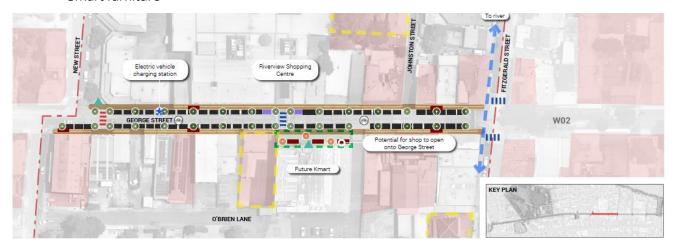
Proposed upgrades for W01.4 George Street Green Boulevard
